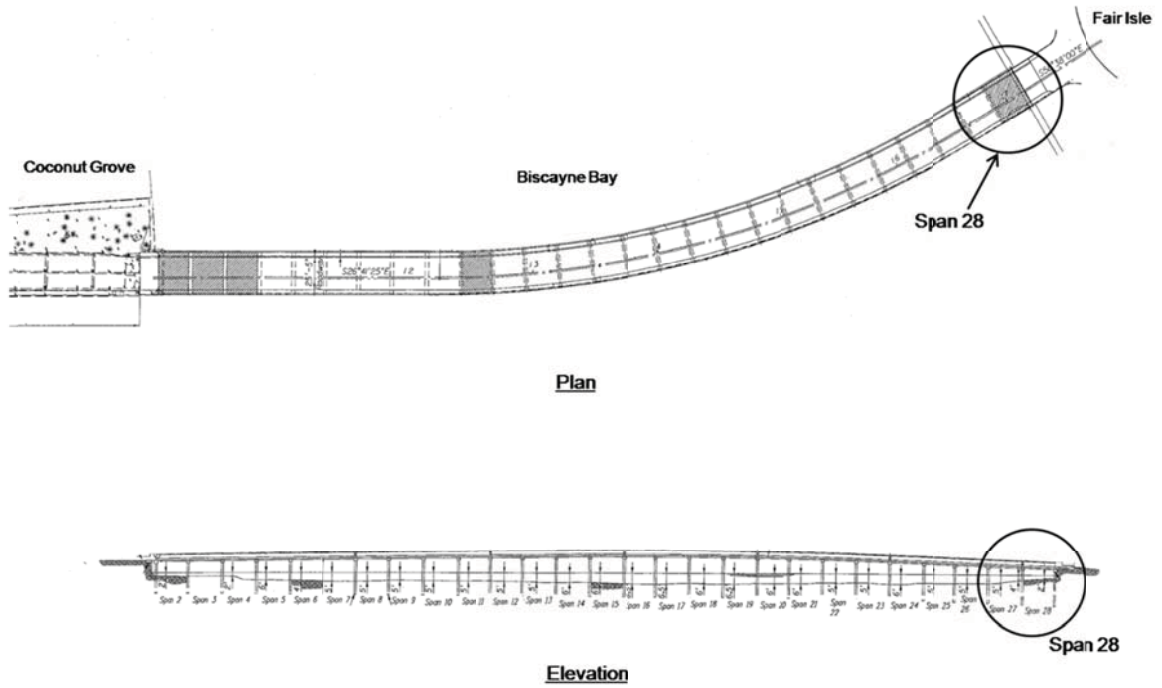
Adopted plan and elevation of Fair Isle Bridge
